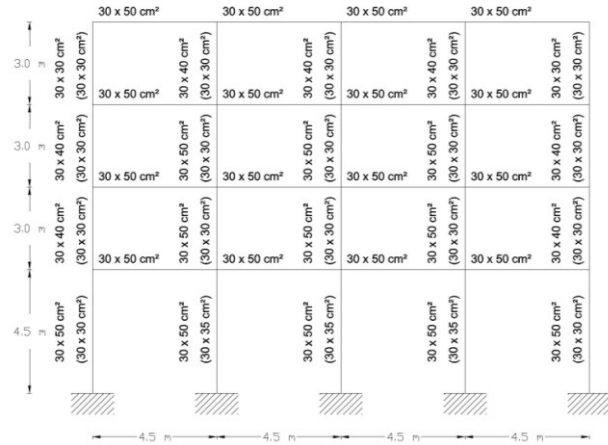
Elevation dimensions and members cross-sections of the case-study buildings.
